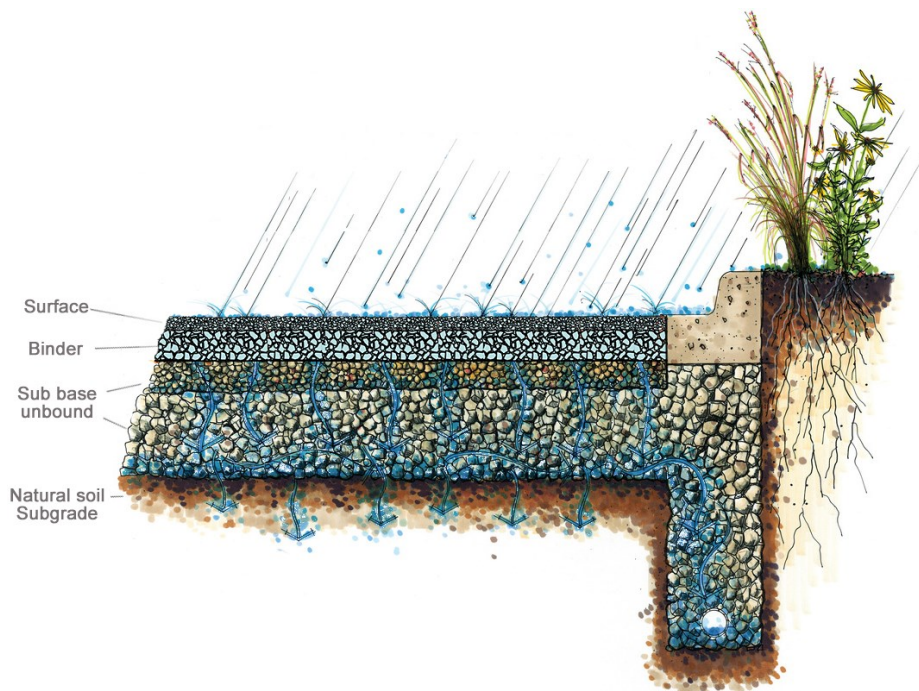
Pavement Cross Sections, altered, original by Doug Adamson
